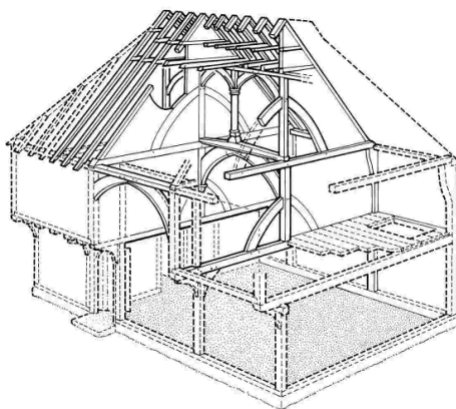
Reconstruction of 22 & 24 Upper Strand Street, arranged parallel to the street (Allan T. Adams)
